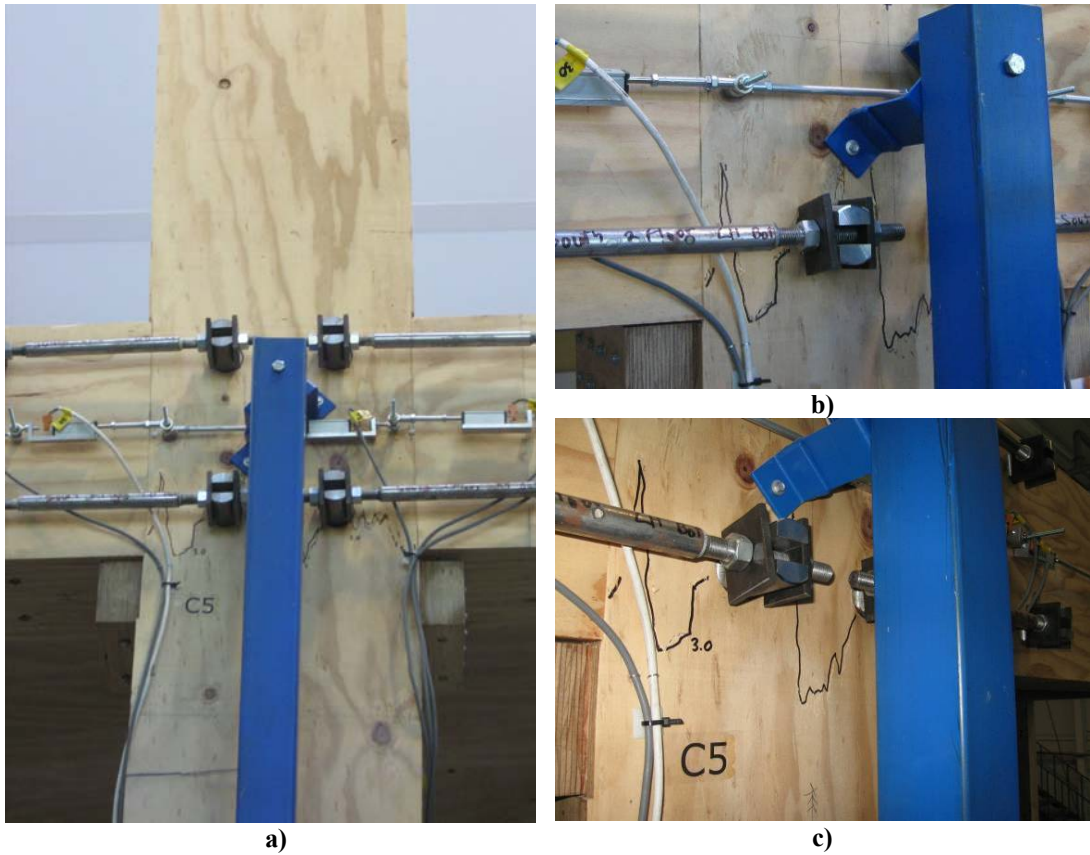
S column failure at 3% Drift: a) & b) Looking north c) Looking south
